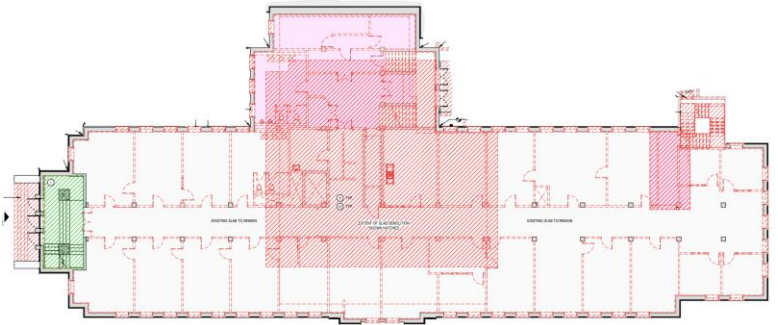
Proposed Outline for Existing Level 2 Slab Demolition. Source: omb Architects + Designers architectural drawings, February 17, 2023.
